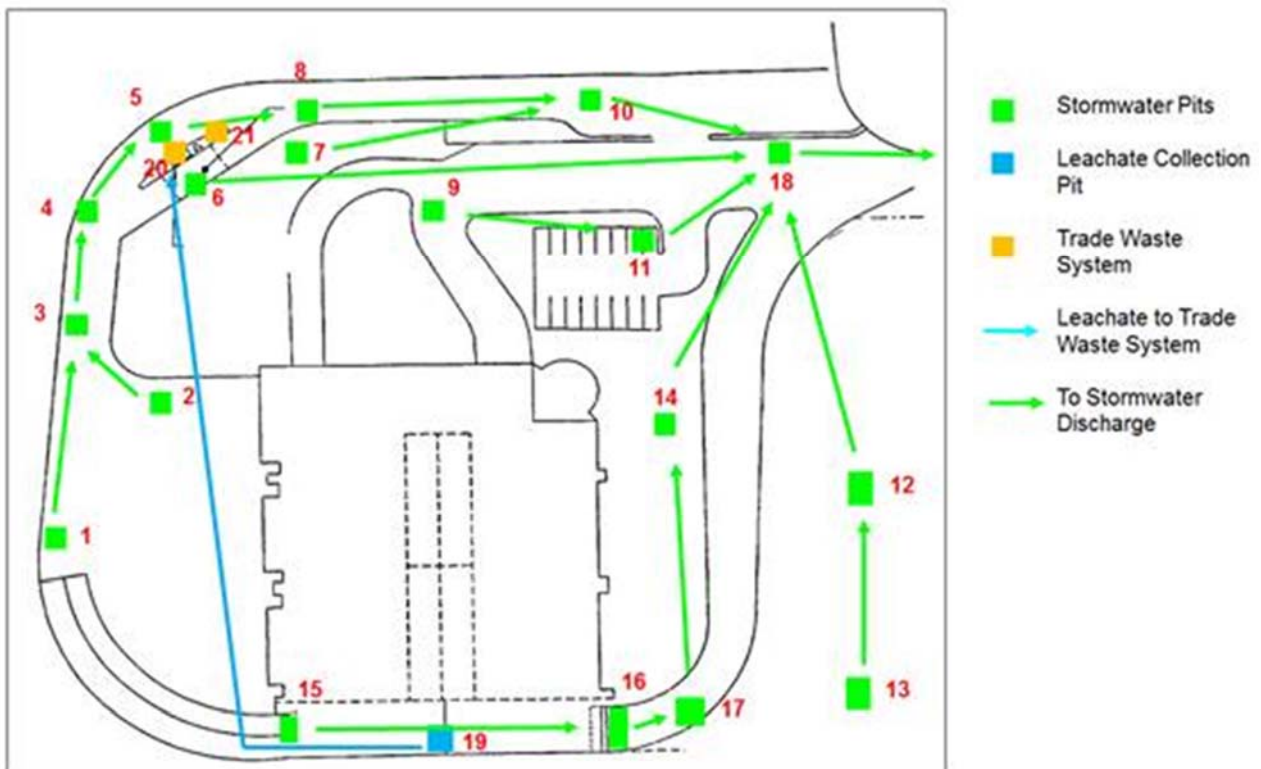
Stormwater and Leachate Management Layout (Not to Scale)
